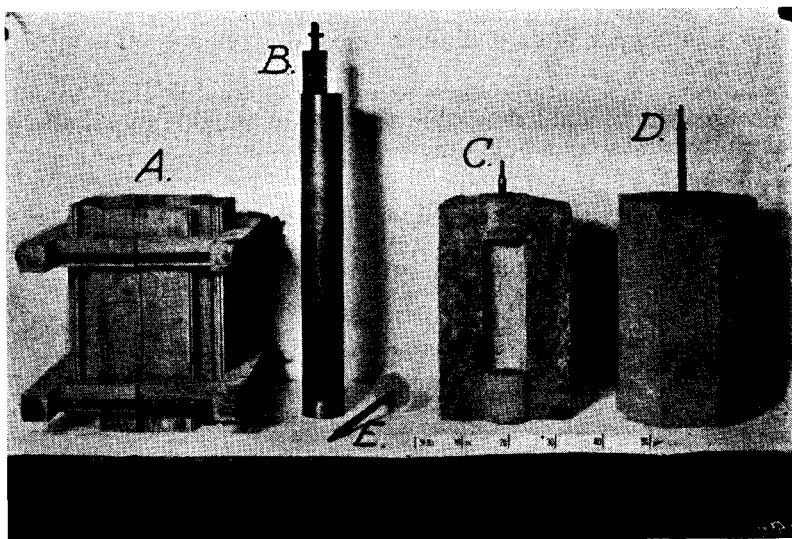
A and B, wooden mold and steel plate core; C, broken test specimen with watertight end plugs; D, test specimen ready for testing of permeability; E, inlet pipe in one end fitted with rubber hose, and in the other a bottom plate for the upper watertight plug.
